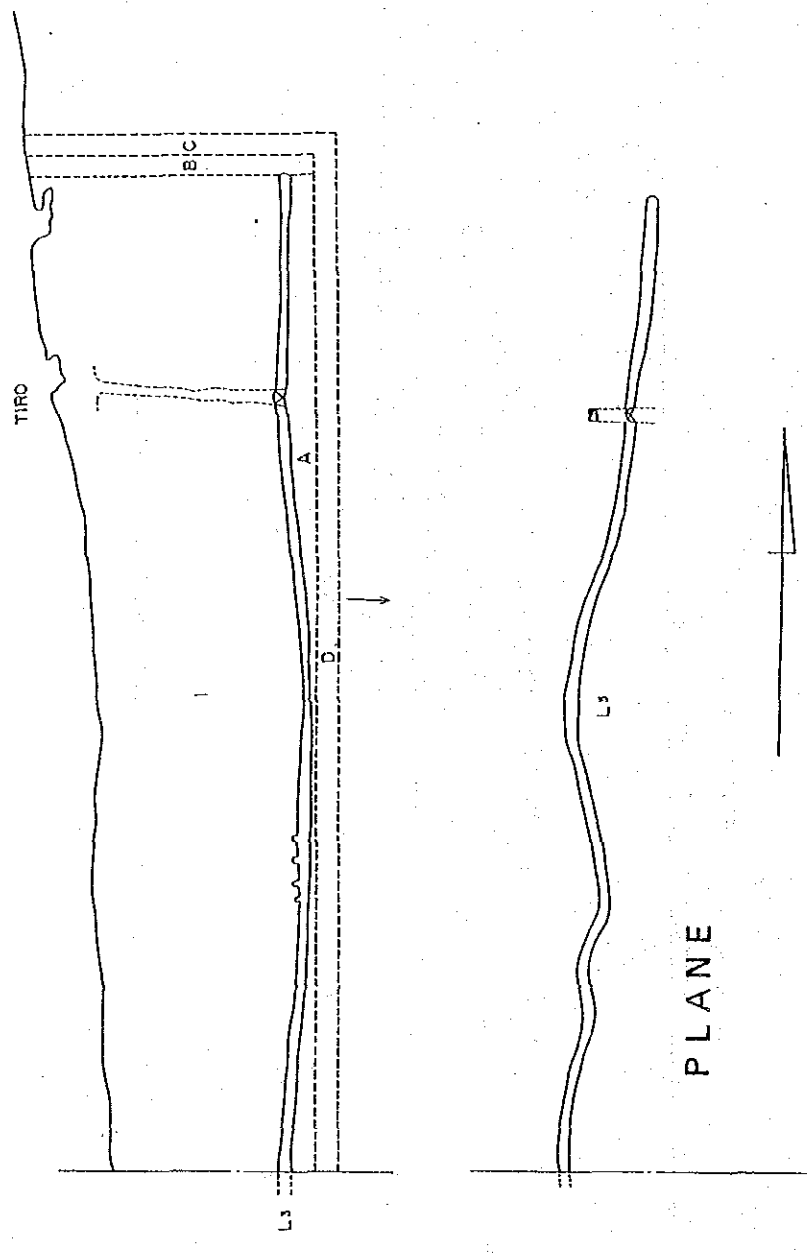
La Presa -Plane and Longitudinal Section-
